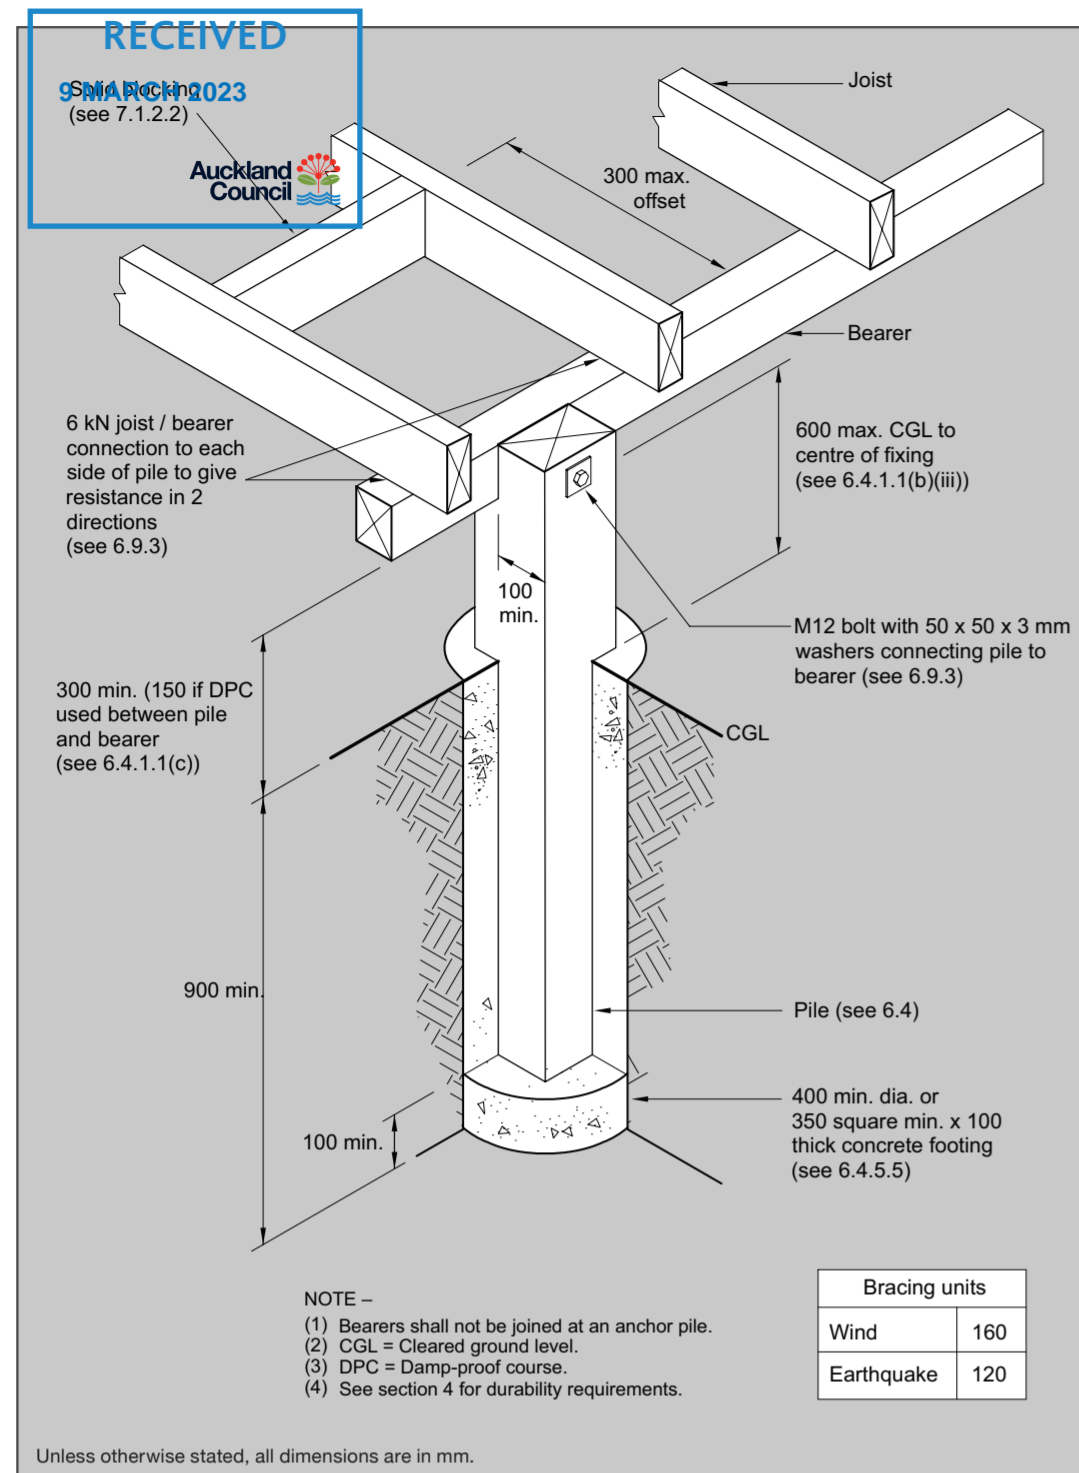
Anchor pile directly connected to bearer only (see 6.9)
